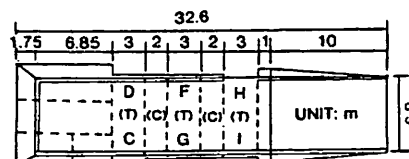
Plan of JR No. 1 embankment (T: test section, C: control section)
